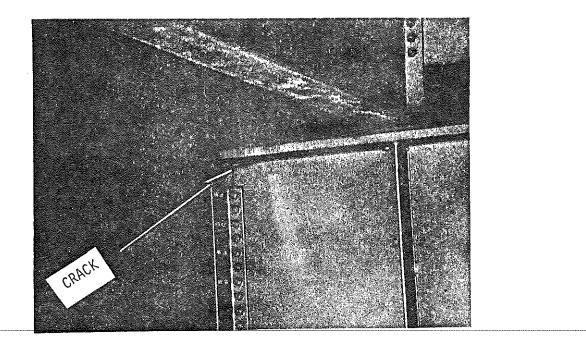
Photograph Shows Typical Crack Site in Cross Beam of I-24 Bridge
